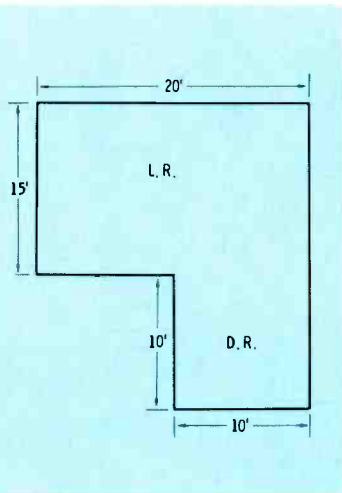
A typical "problem" layout in stereo installations is the "L"-shaped living room/dining room arrangement.
